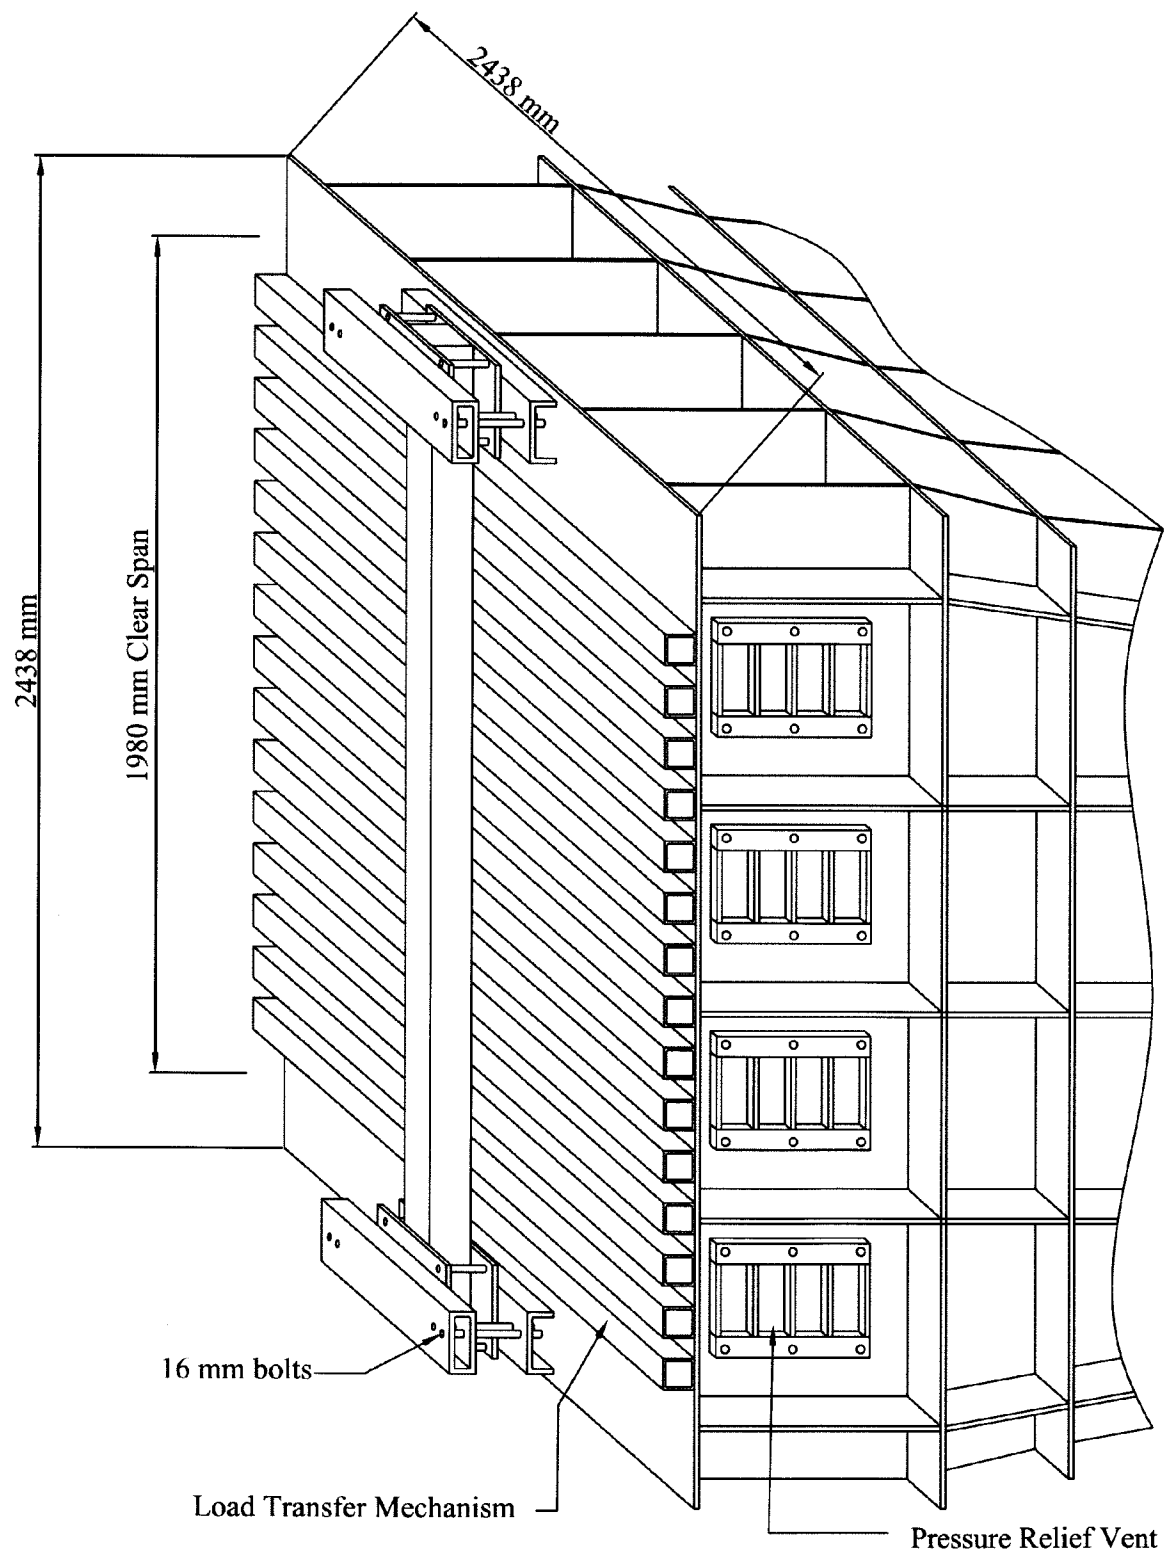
Detailing of Load Column Test Setup and Load Transfer Mechanism
